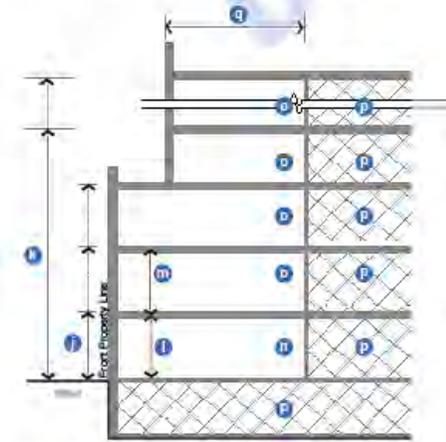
(2). Storefront Building: Height & Use Requirements.
